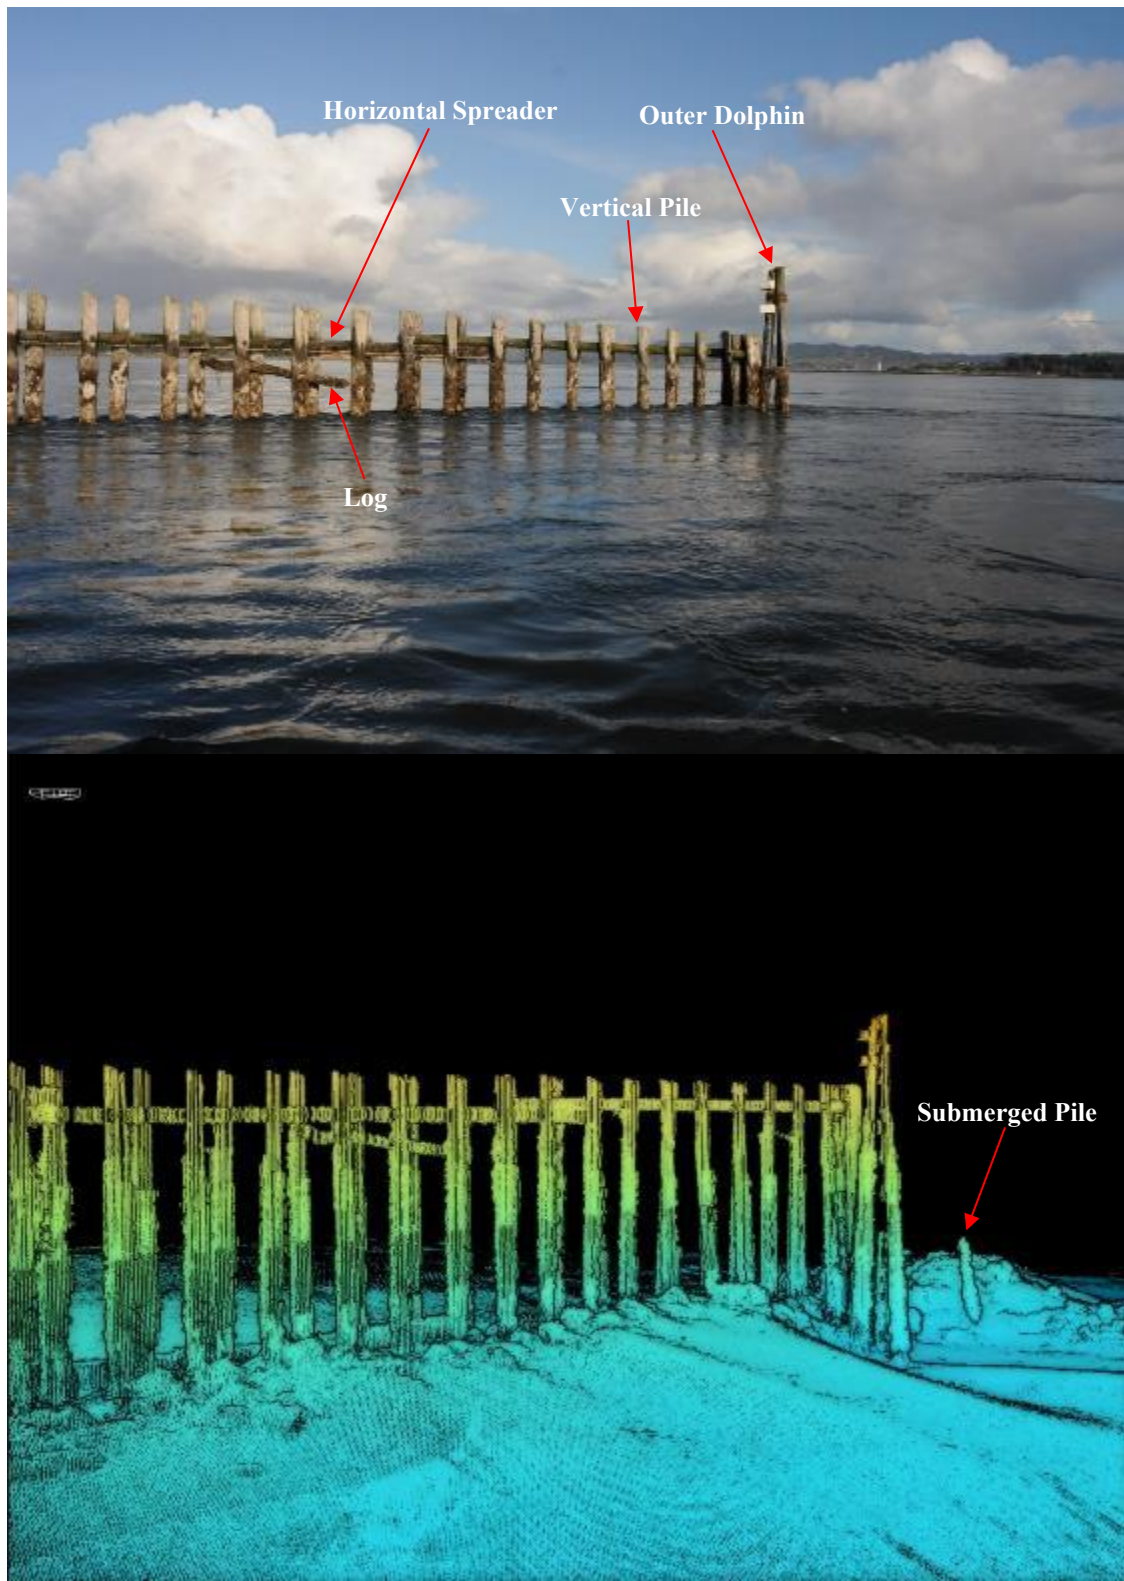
Pile Dike 6.4 viewed from downstream looking riverward.
